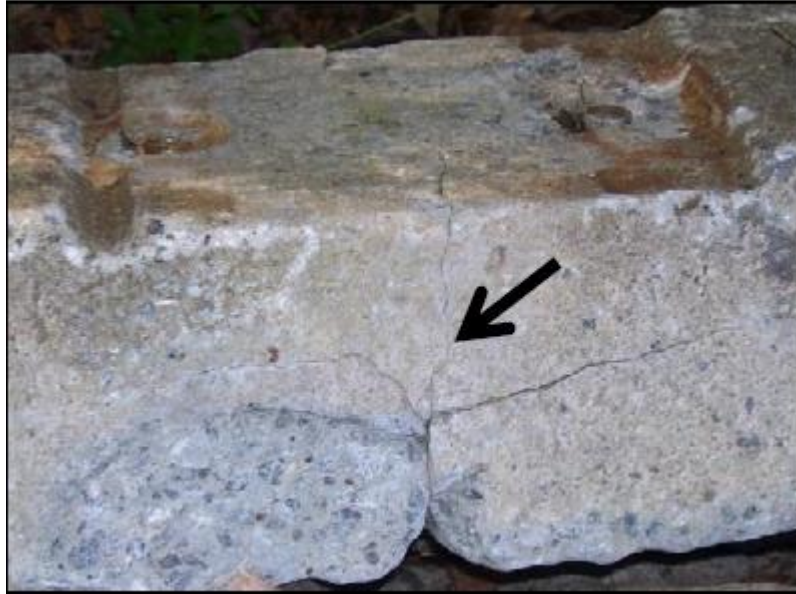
Positive flexural crack beneath a concrete tie rail seat (Zeman, 2010)
